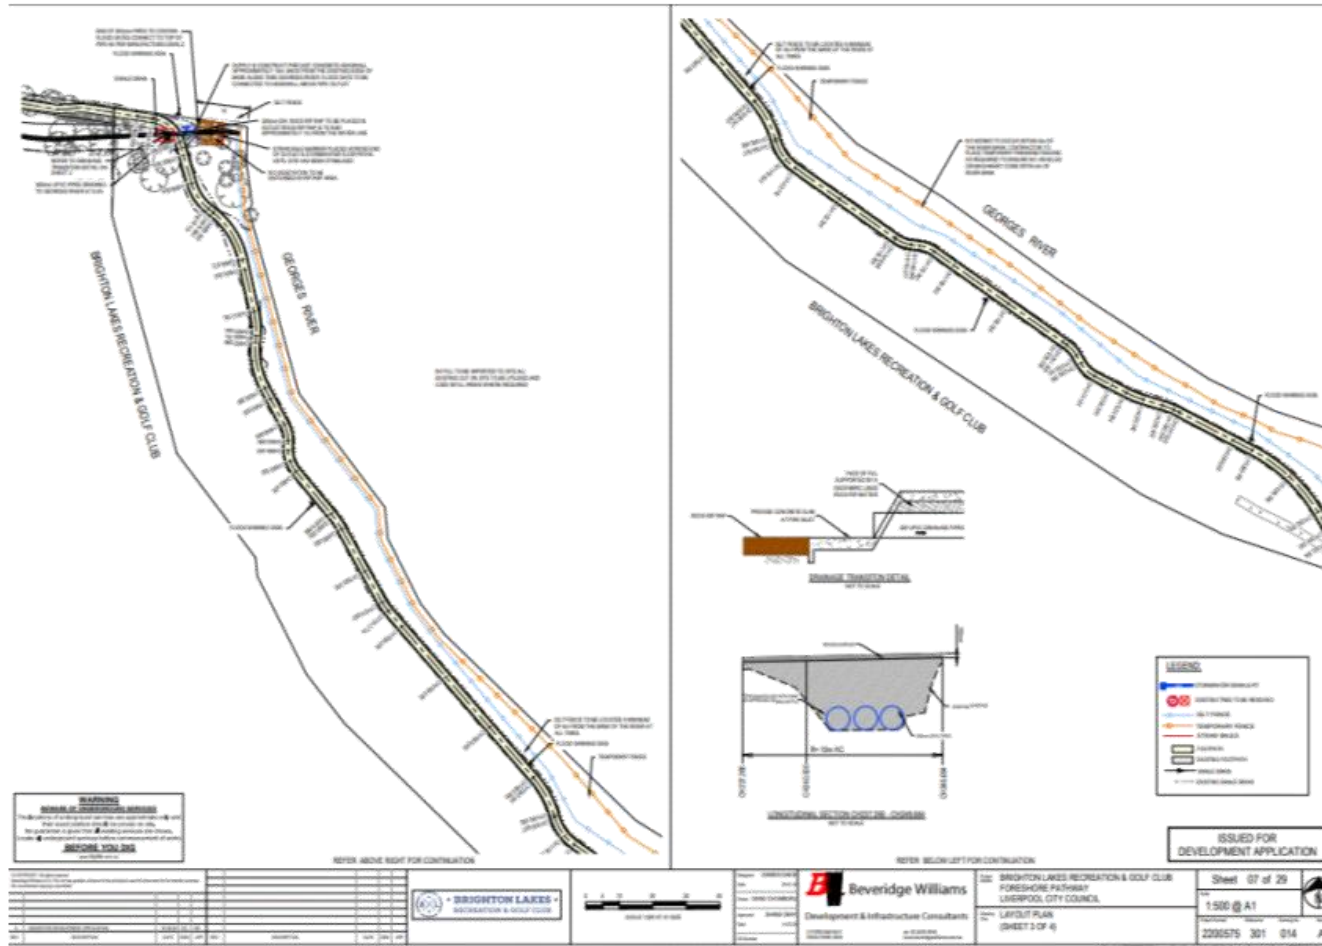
D - A schematic indication of the elements of the proposed pathway construction in the upper and central southern sections of Stage 2 (for detail see Beveridge Williams layout plans 2024)
